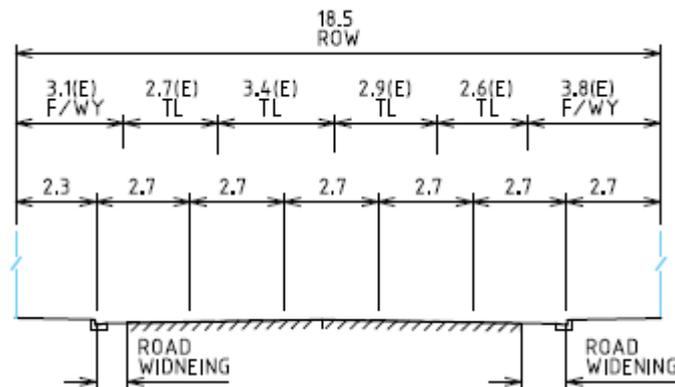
Indicative Cross Section Between Alexandra Avenue and Toorak Road
